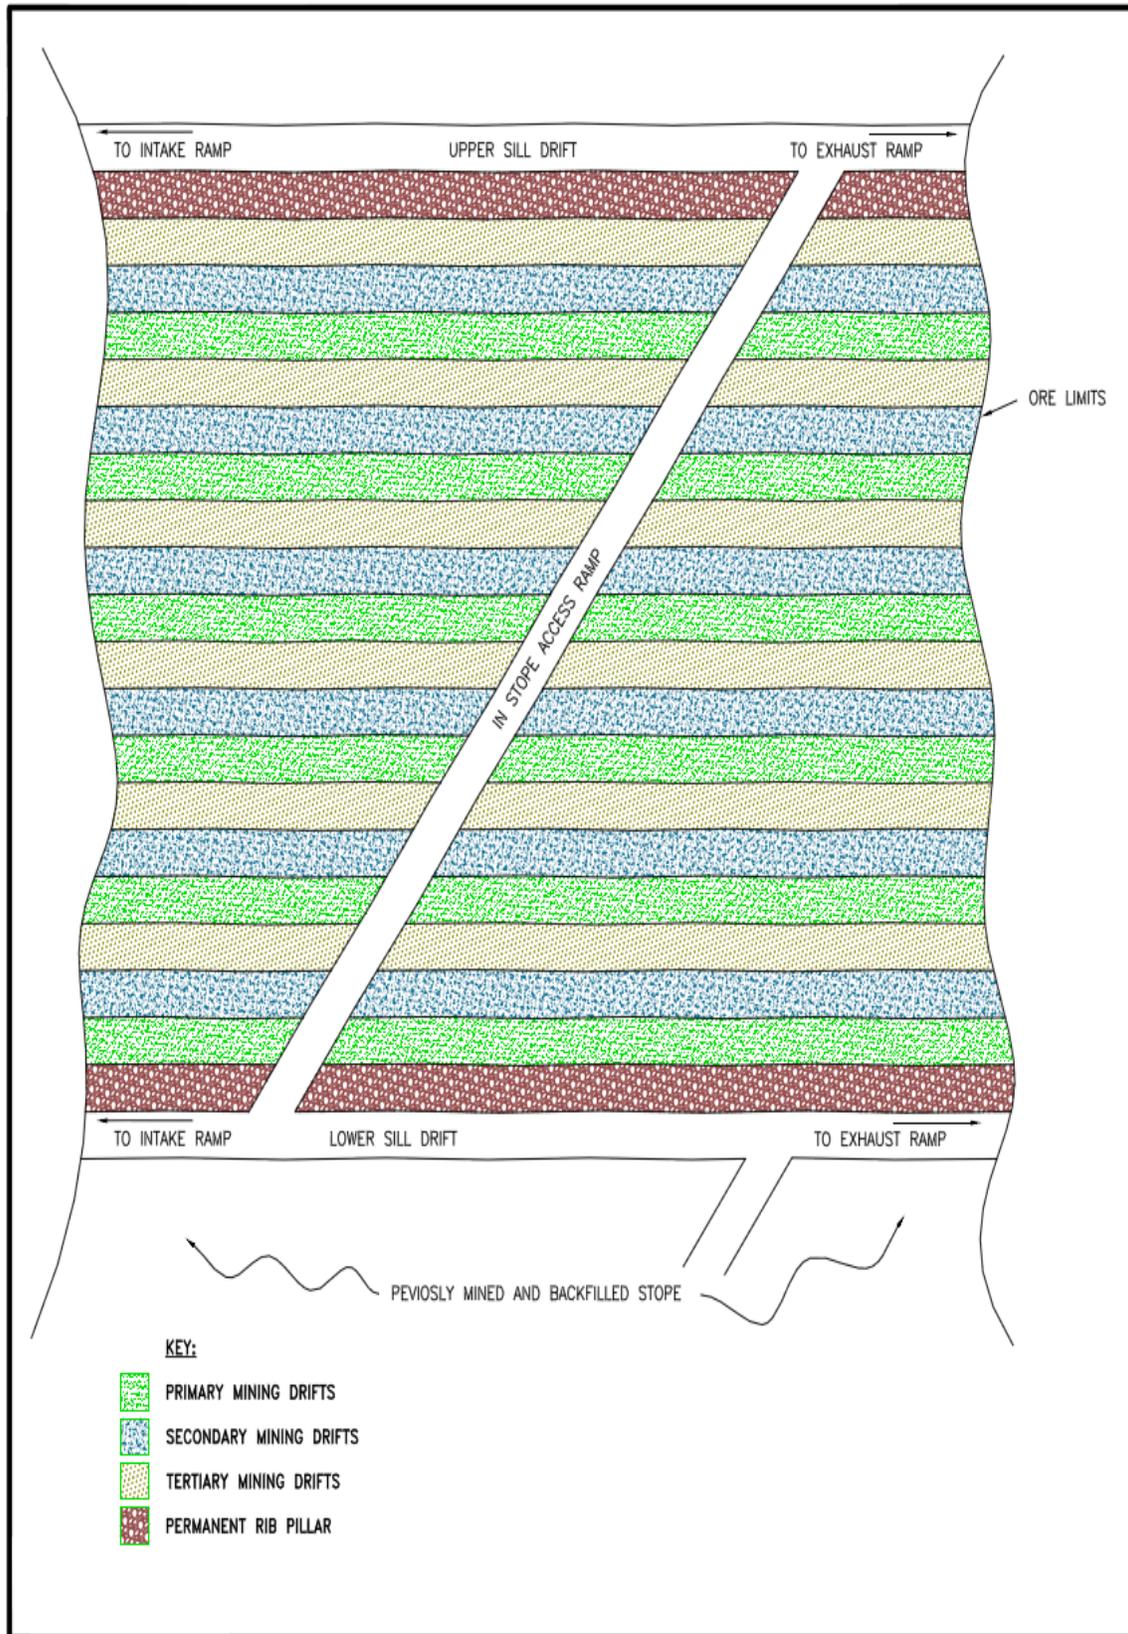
Typical Drift and Fill Mine Design (Plan View)
